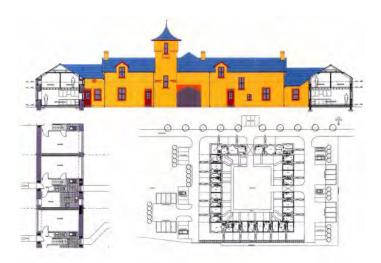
0328/FUL/96 drawings for the adjoining Easter Inch Steading site
